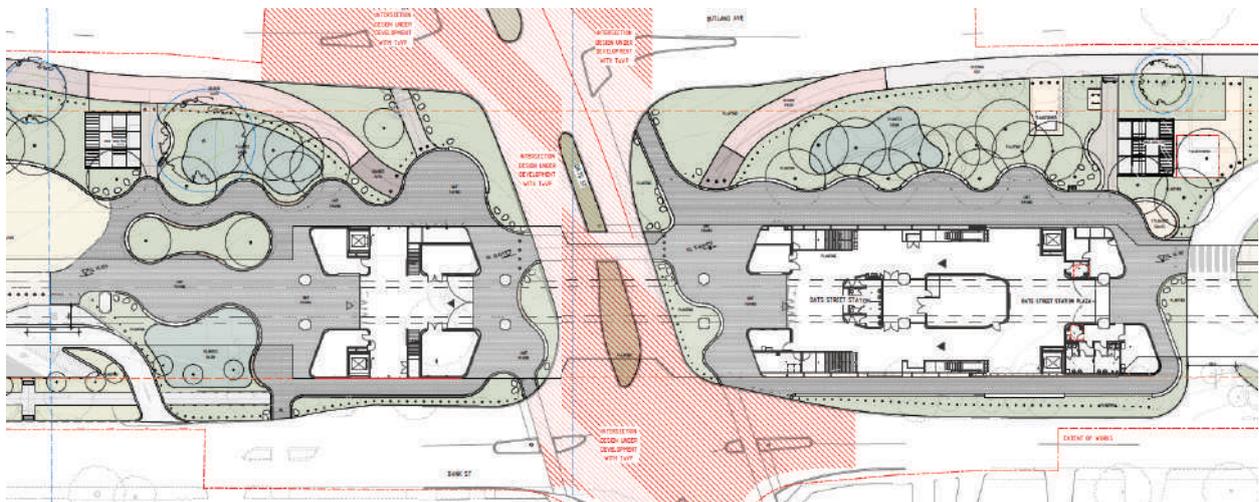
Oats Street Train Station, Forecourt and Plaza General Arrangement Plan (refer to Appendices H and I for further details)
